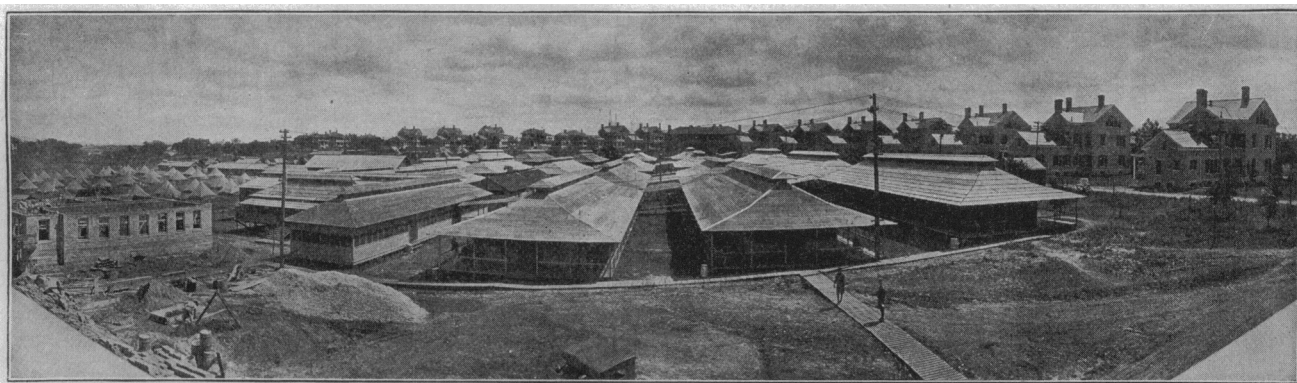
Temporary pavilion wards at Base Hospital 1, Fort Sam Houston, San Antonio, Tex. Brick buildings in rear and to right are cavalry officers' quarters. Building under construction on left is the new laboratory for Department Laboratory 1. Tentage on left is a part of Field Hospital Company 6.
